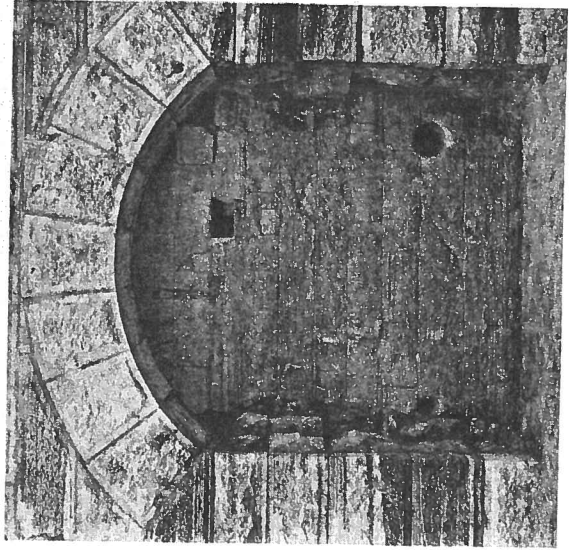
A layer of loose rubble separated the outer blocking wall in Arch 20 from this inner blocking wall.
